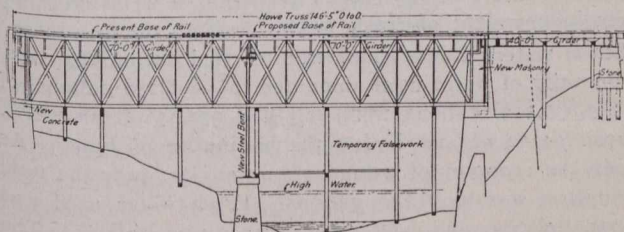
Replacing a Howe Truss with Plate Girders.
